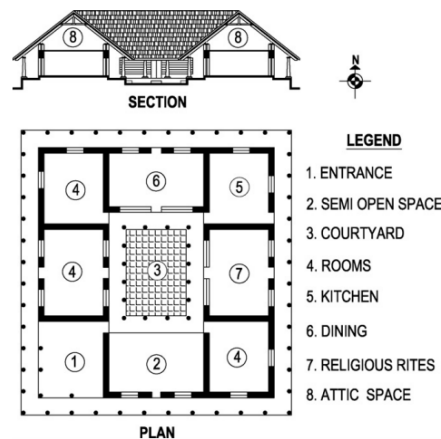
Typical plan and section of nalukettu (Diji, 2010)
